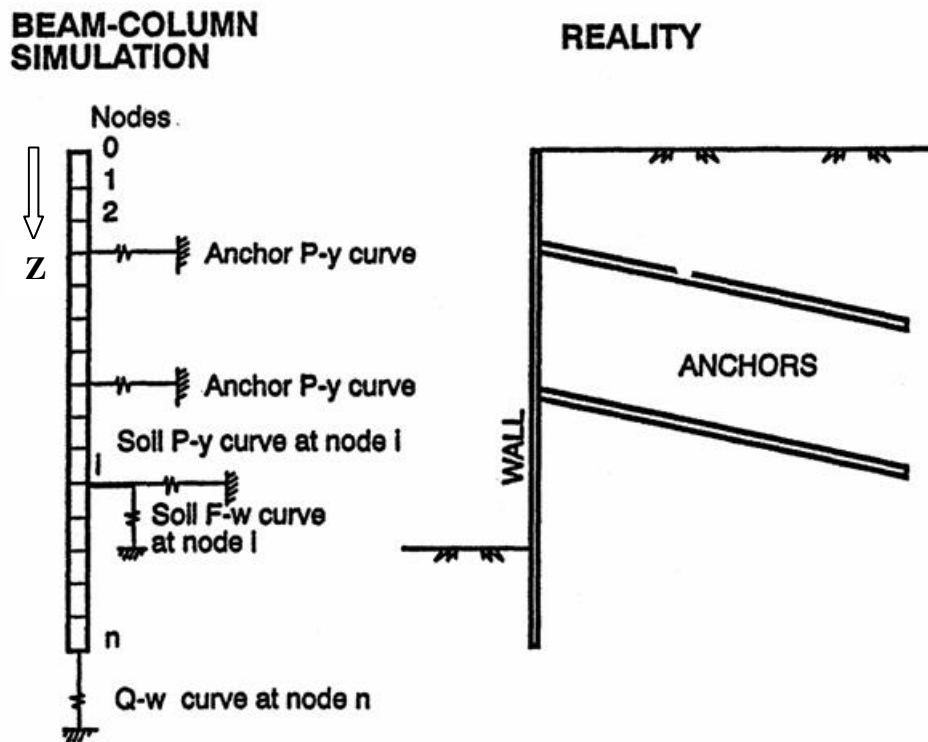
4 Boundary Element Model of Repeatable Section of Wall (After Briaud and Kim, 1998)
